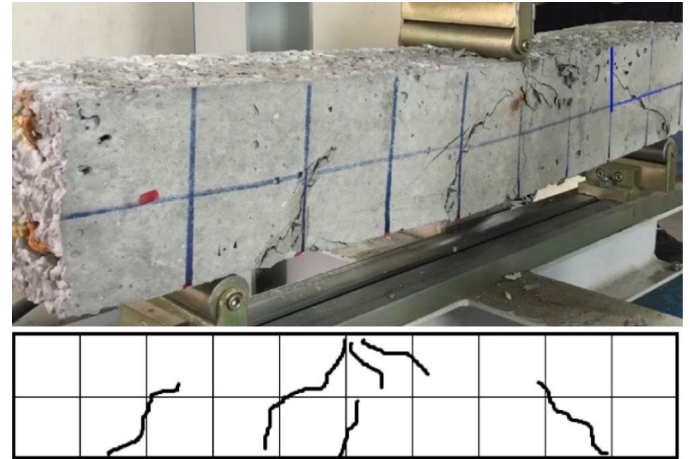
Reinforced concrete beam's crack pattern with 30% EPS
